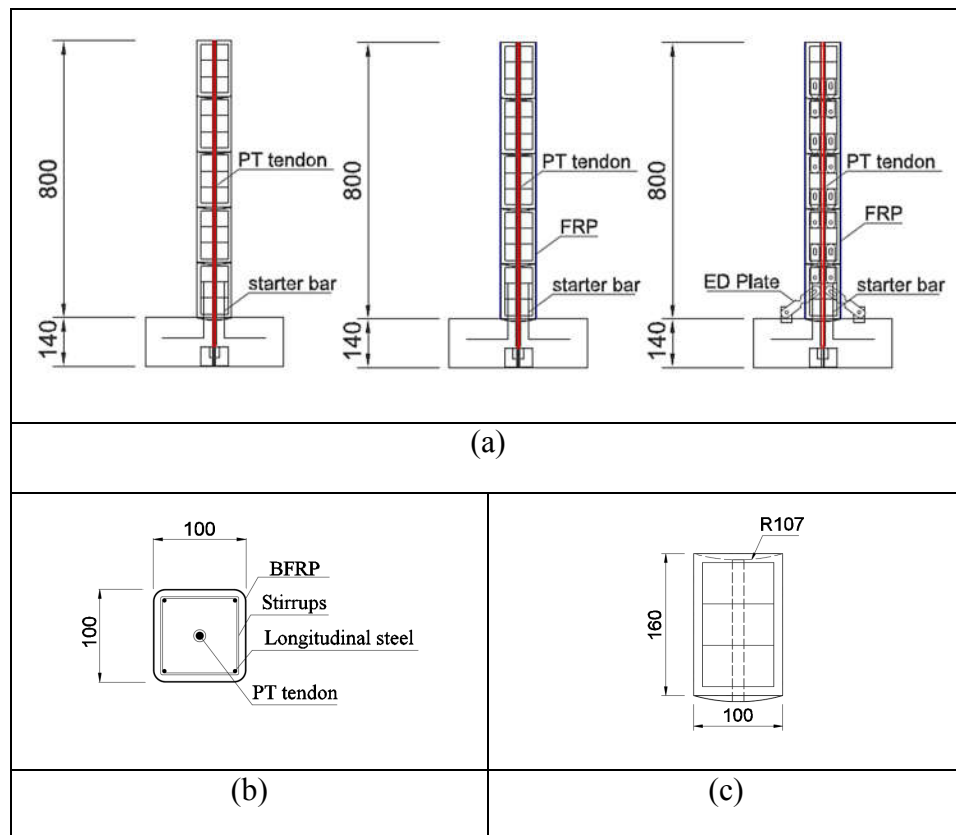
Schematic drawings of the specimens (a) elevation view, (b) cross section and (c) details of the segment and domed-shape shear key
